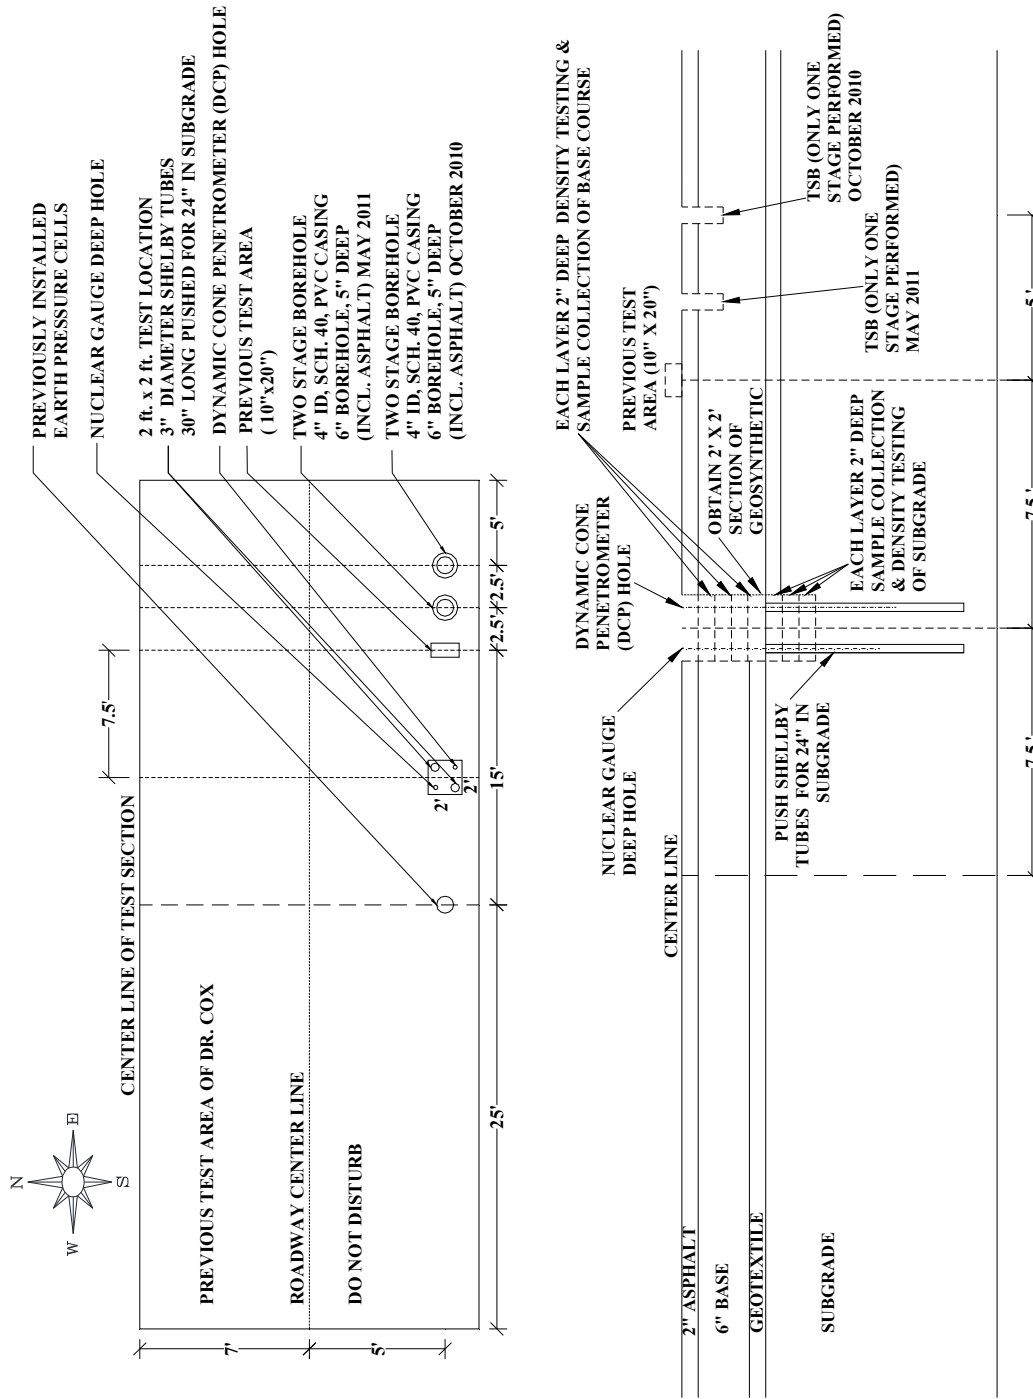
Plan and profile view of typical test locations for Shelby tubes, two stage borehole, previously installed earth pressure cells, two foot by two foot test area, and previous test area for the six-inch thick base course sections.
